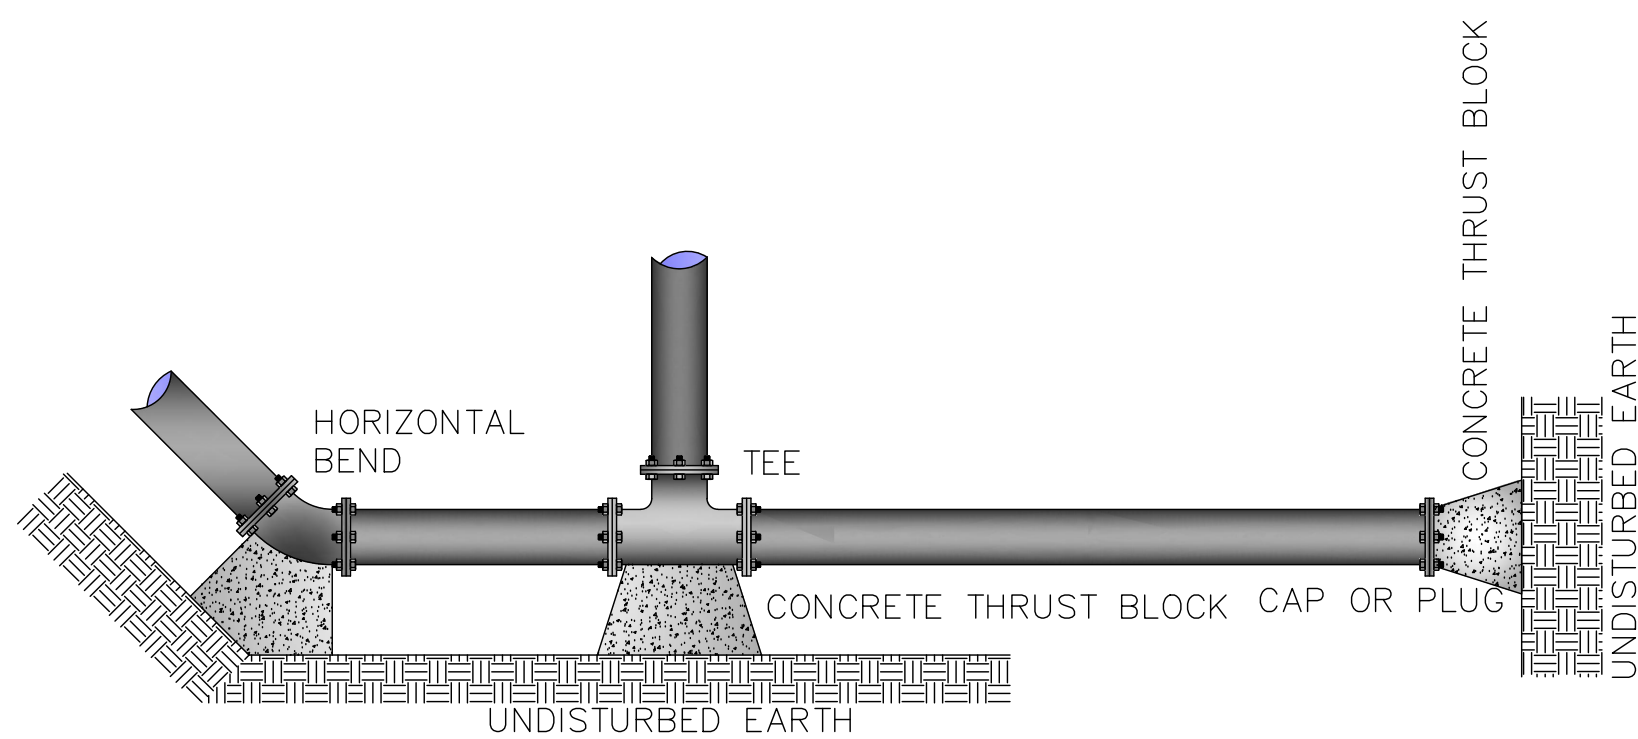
DETAIL FOR TEMPORARY CONSTRUCTION WATER
